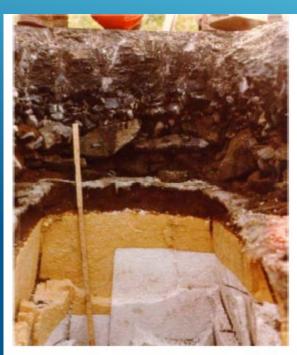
Excavation of the first EPS embankment at Flom bridge (EPS and polyurethane as protective layer).
